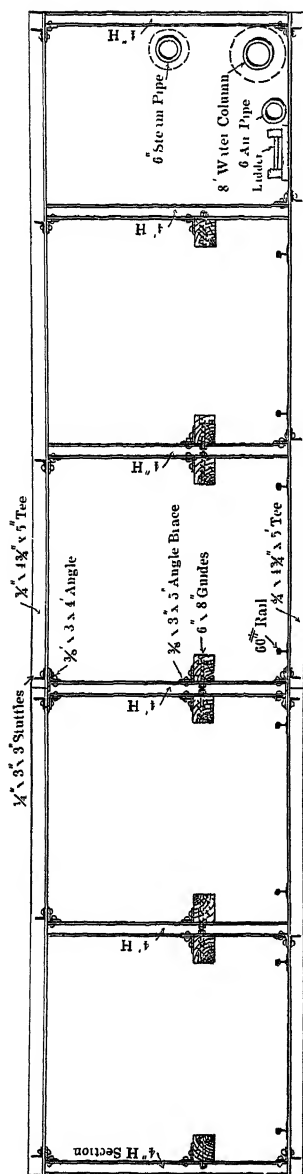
PLAN OF D SHAFT STEEL-WORK.
